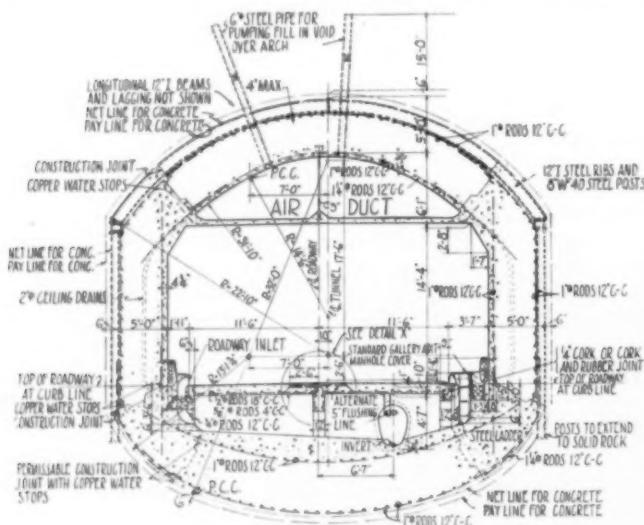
Final Design of Tunnel Section in Sand Seam Area of Kittatinny Mountain Tunnel
